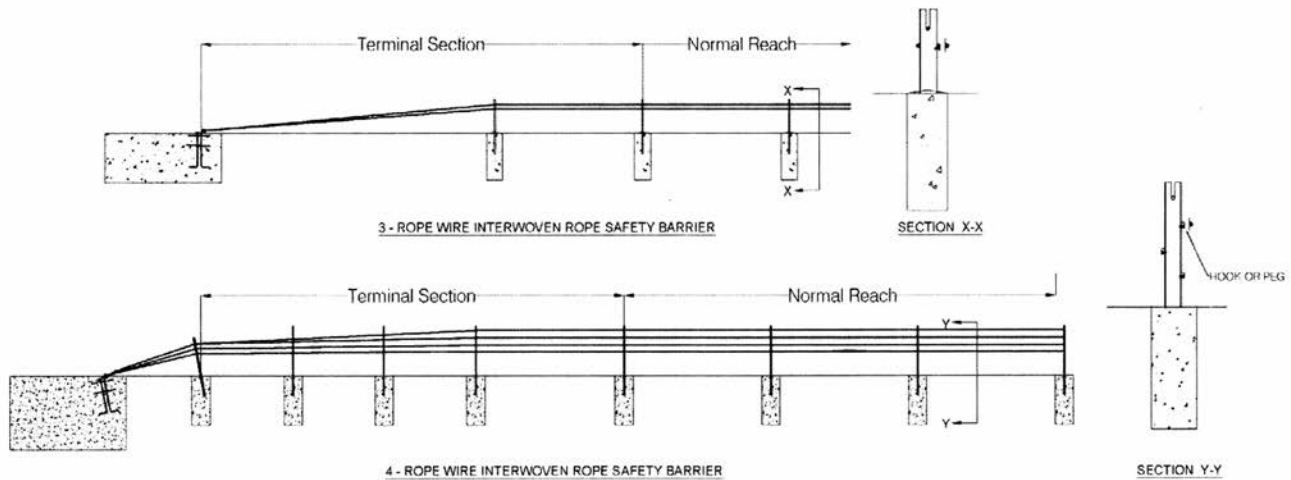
Typical Details of Interwoven Wire Rope safety Barrier
